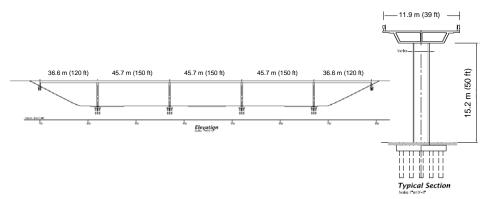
Elevation of Caltrans highway bridge (adapted from Ketchum et al., 2004)
